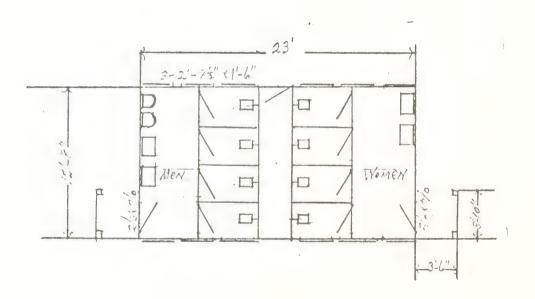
Comfort Station Floor Plan (2/19/51). Notice men's room contains four water closets, two urinals and two lavatories, an arrangement which neither matches original design nor extant conditions.
